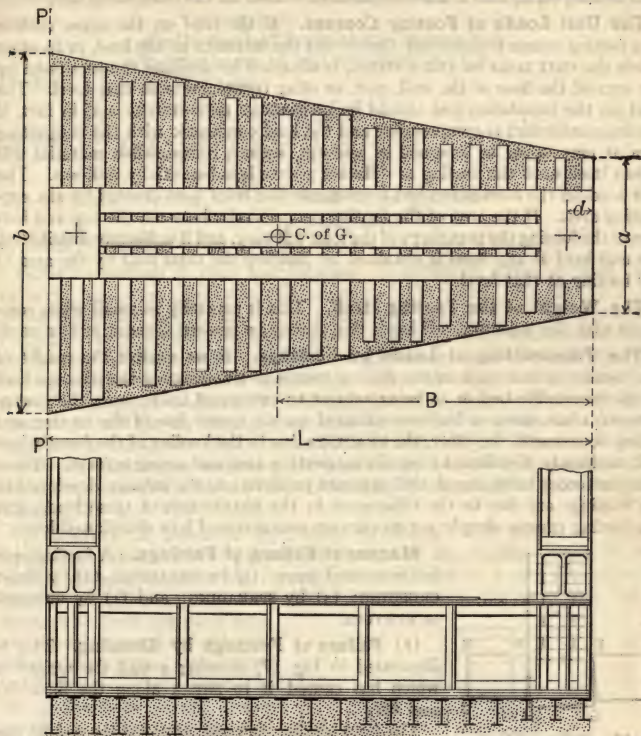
Girdering-method of Foundations. Two Unequal Loads
